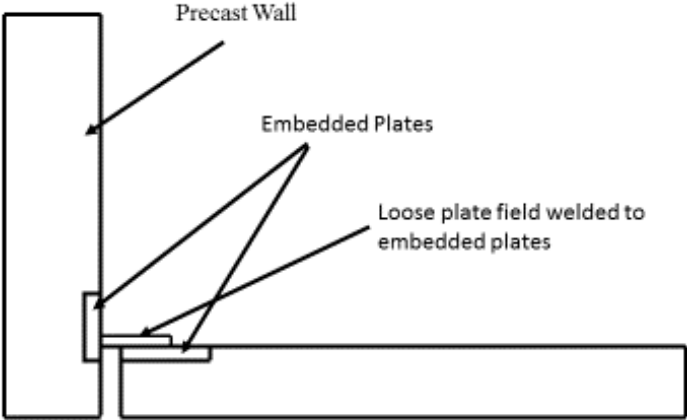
Welded Flat Plate Precast Wall Connection (Adapted from The Constructor 2014)
